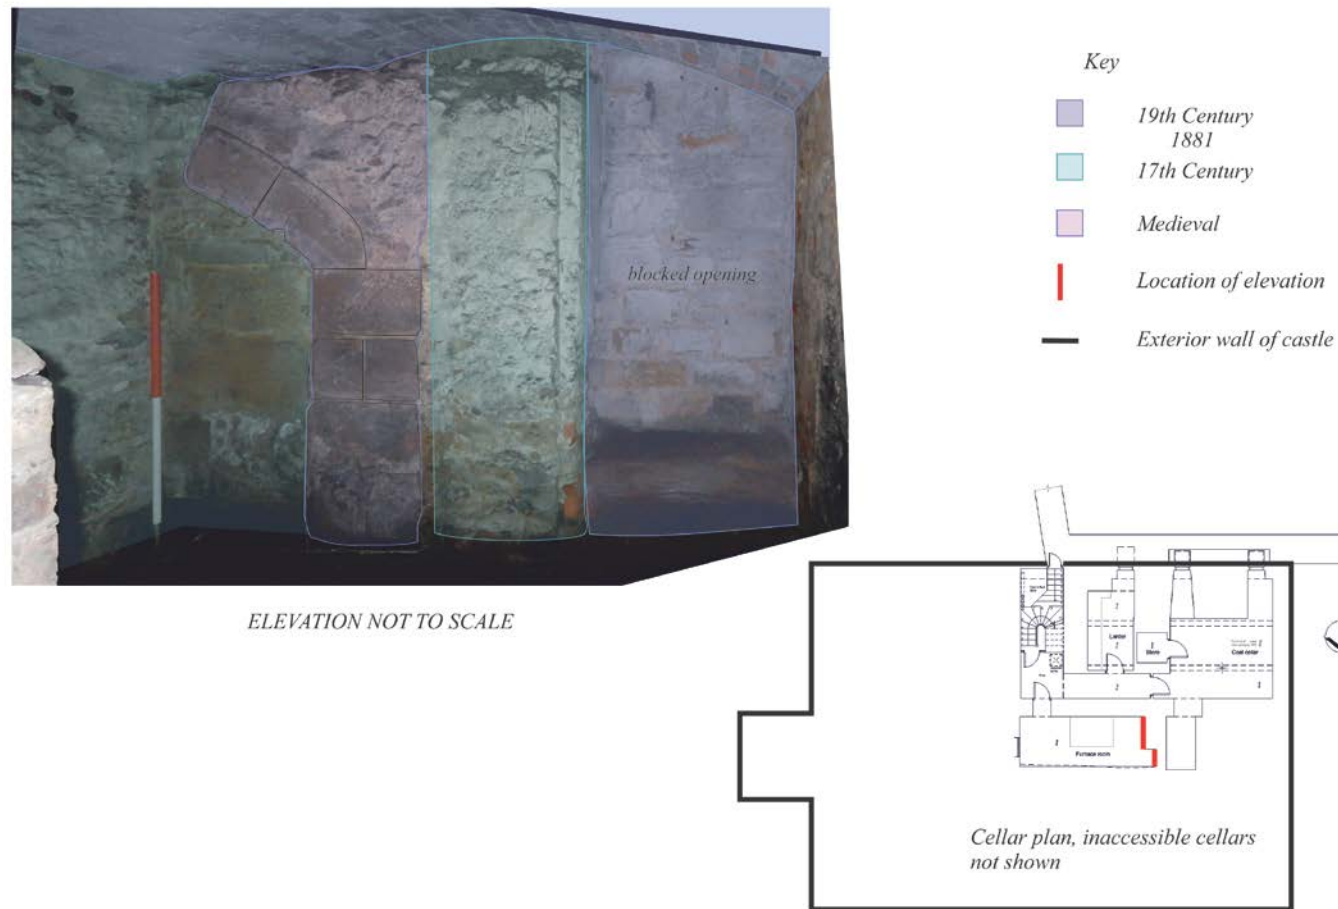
Sketch section showing phasing on west wall of furnace room in the cellar
